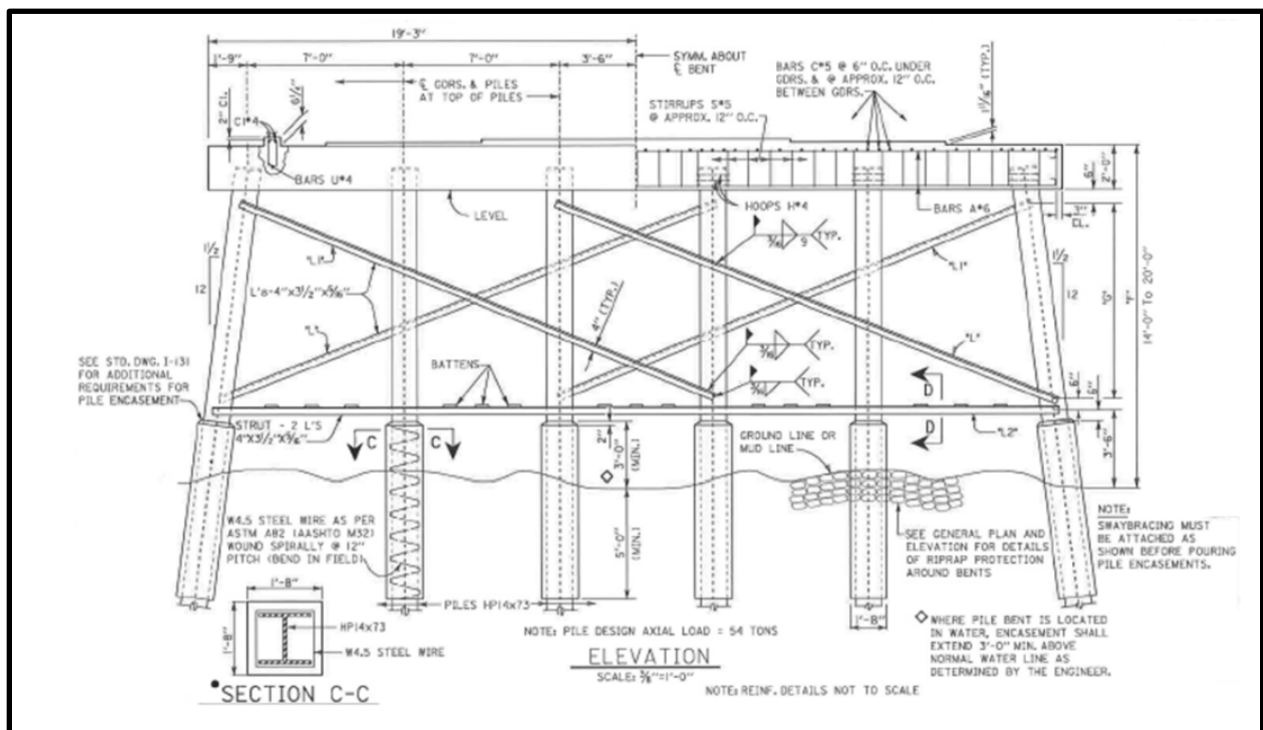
Typical multi-span bridge supported on H-piles on flow channel [5]
